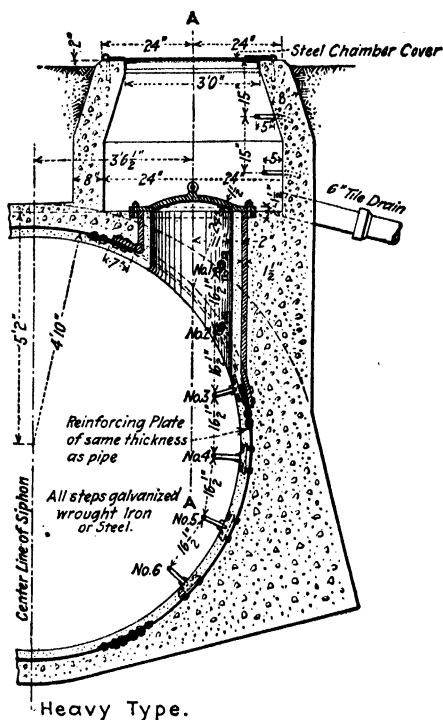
Manhole, steel pipe siphons, Catskill aqueduct.
